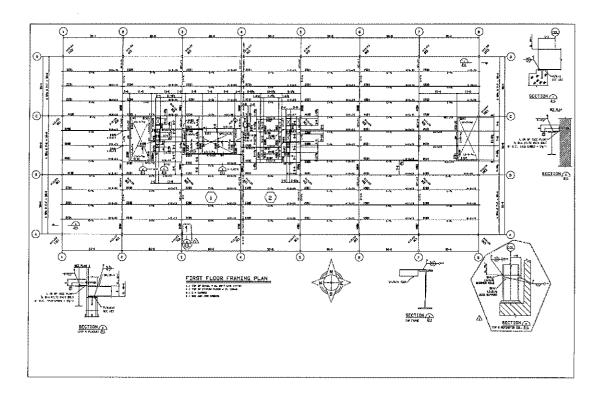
First floor framing plan of the steel building shown in Figure 1 (Source AISC)
